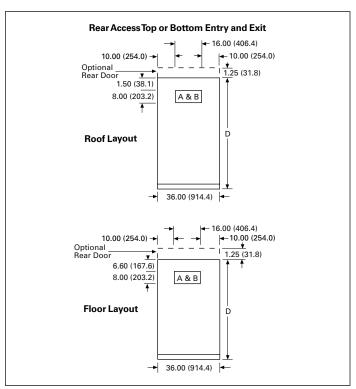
5 kV and 15 kV Roof Layouts and Floor Layouts
